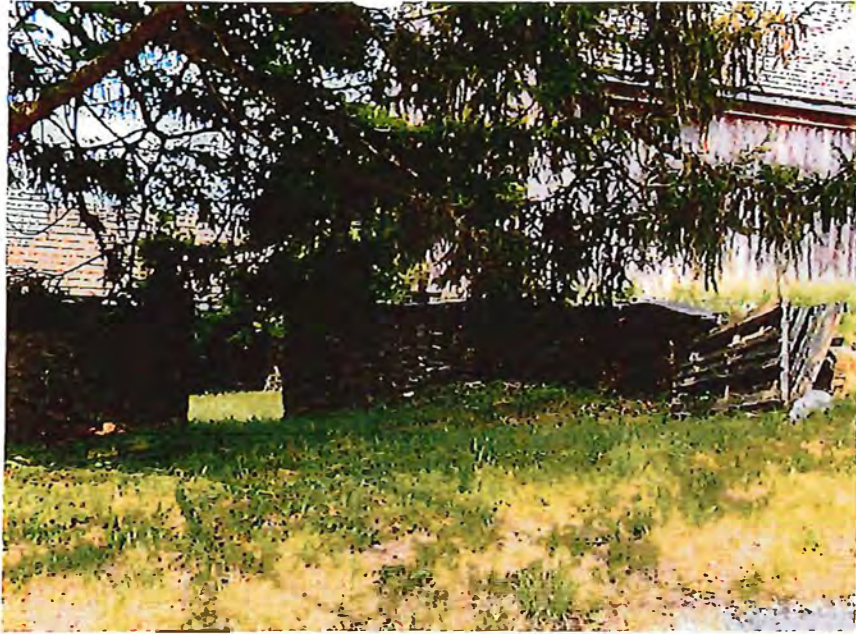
of 30: Historic Resource #75 - Barn, showing exterior Stable Yard wall, note curved wall (center), and stone South Barn ramp wall (right background) looking Northwest.
